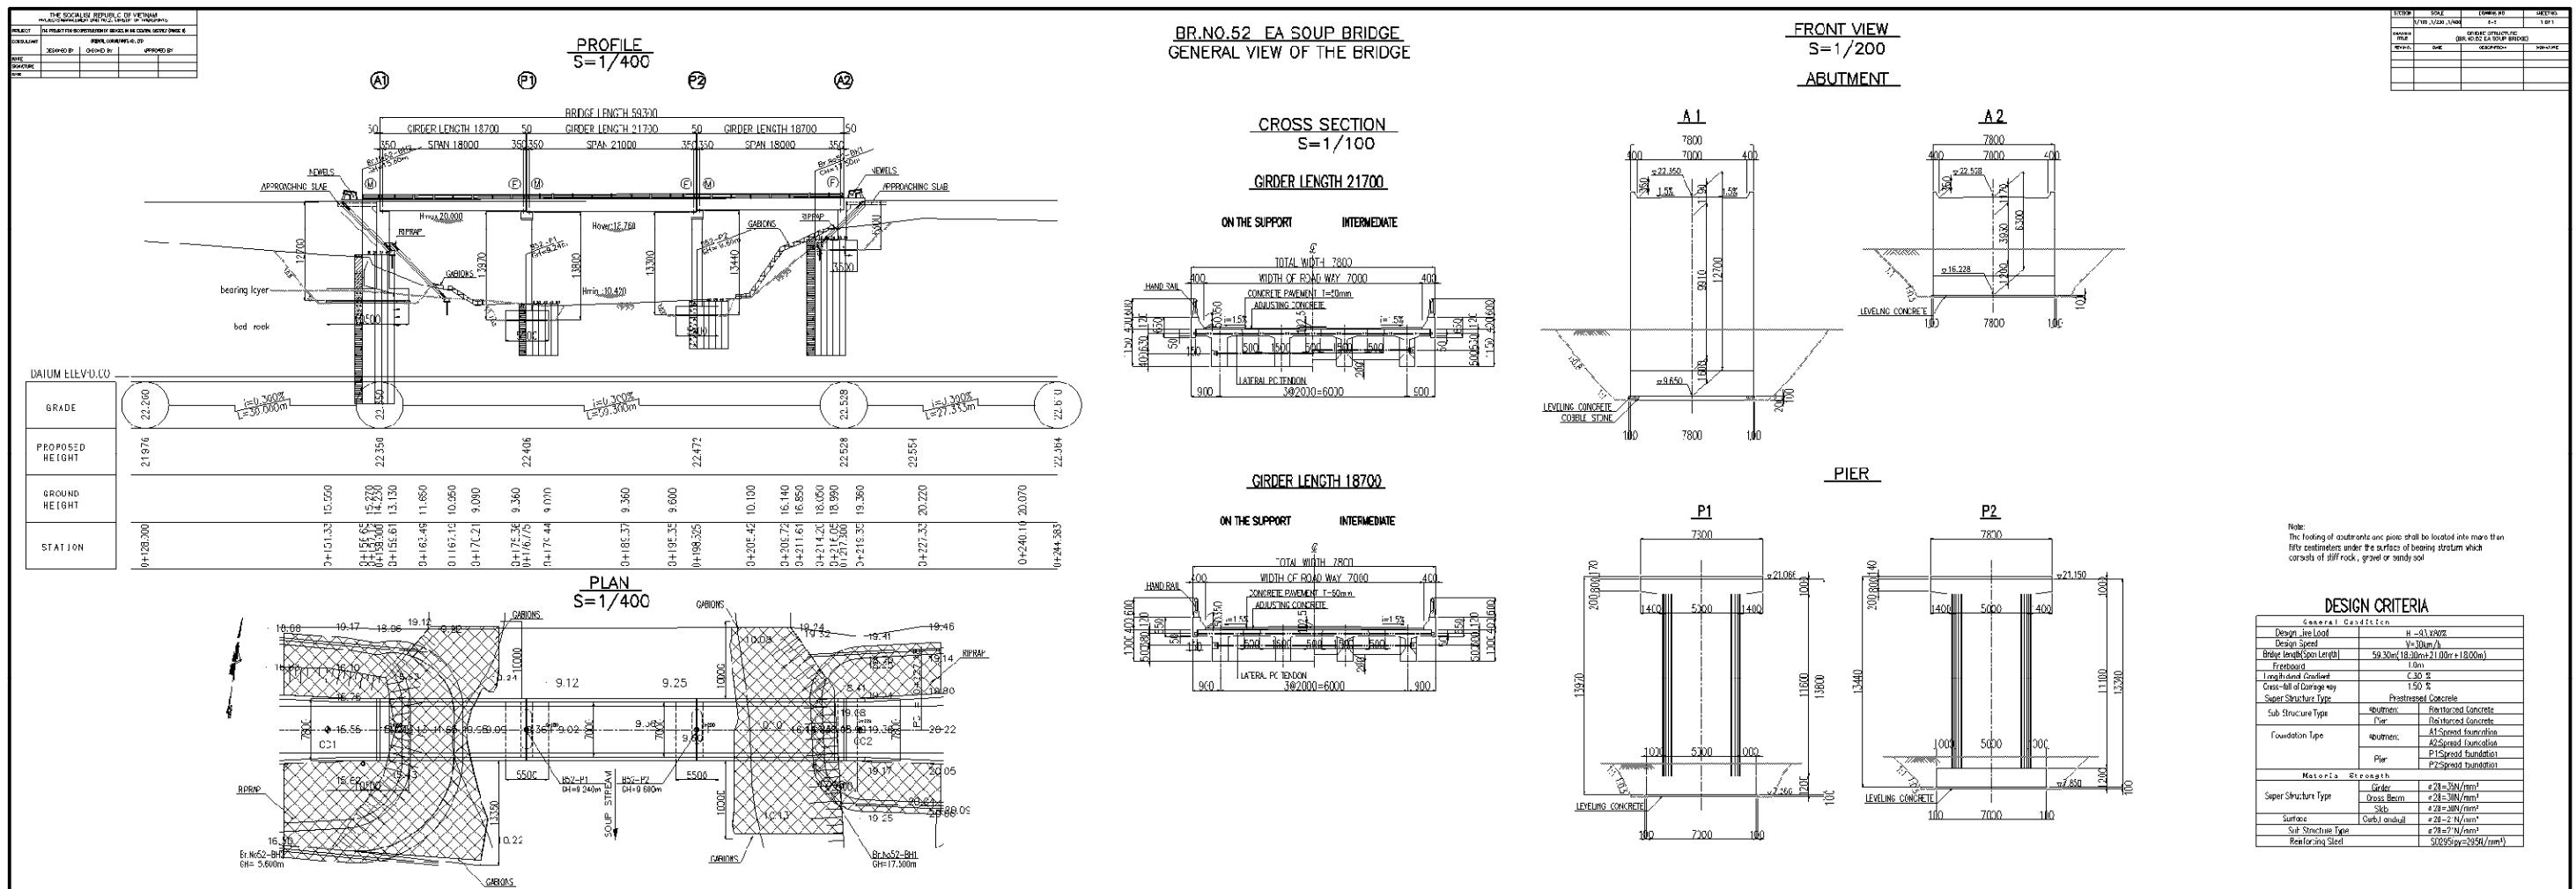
Ea Suop Bridge (General View for Structure)
